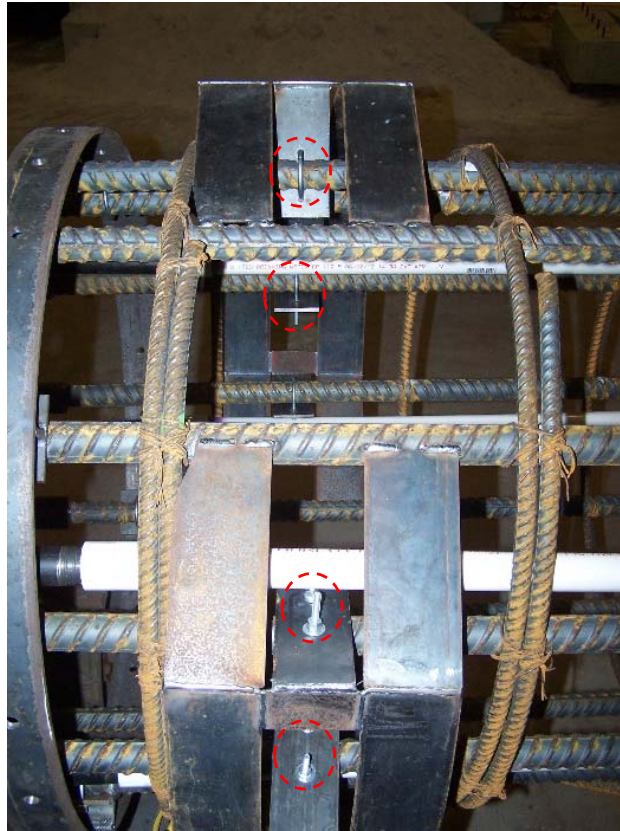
Inner steel ring for membrane seals attached to cage using U-bolts
